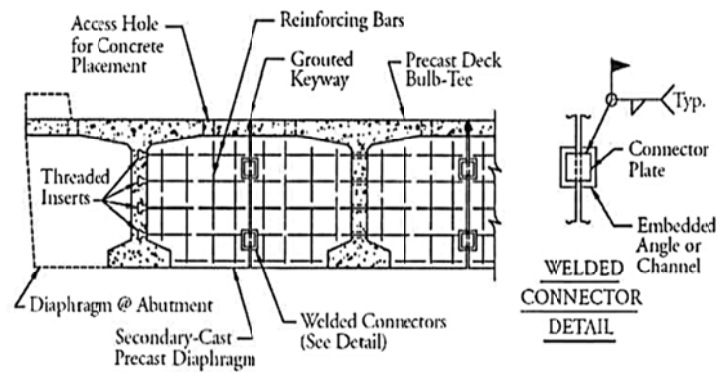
Cast-in-Place Concrete Diaphragm Details (PCI 2011)
